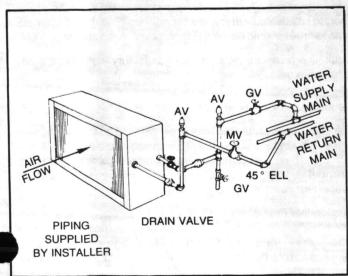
Typical Piping for Type W, Two-Row Water Coil
